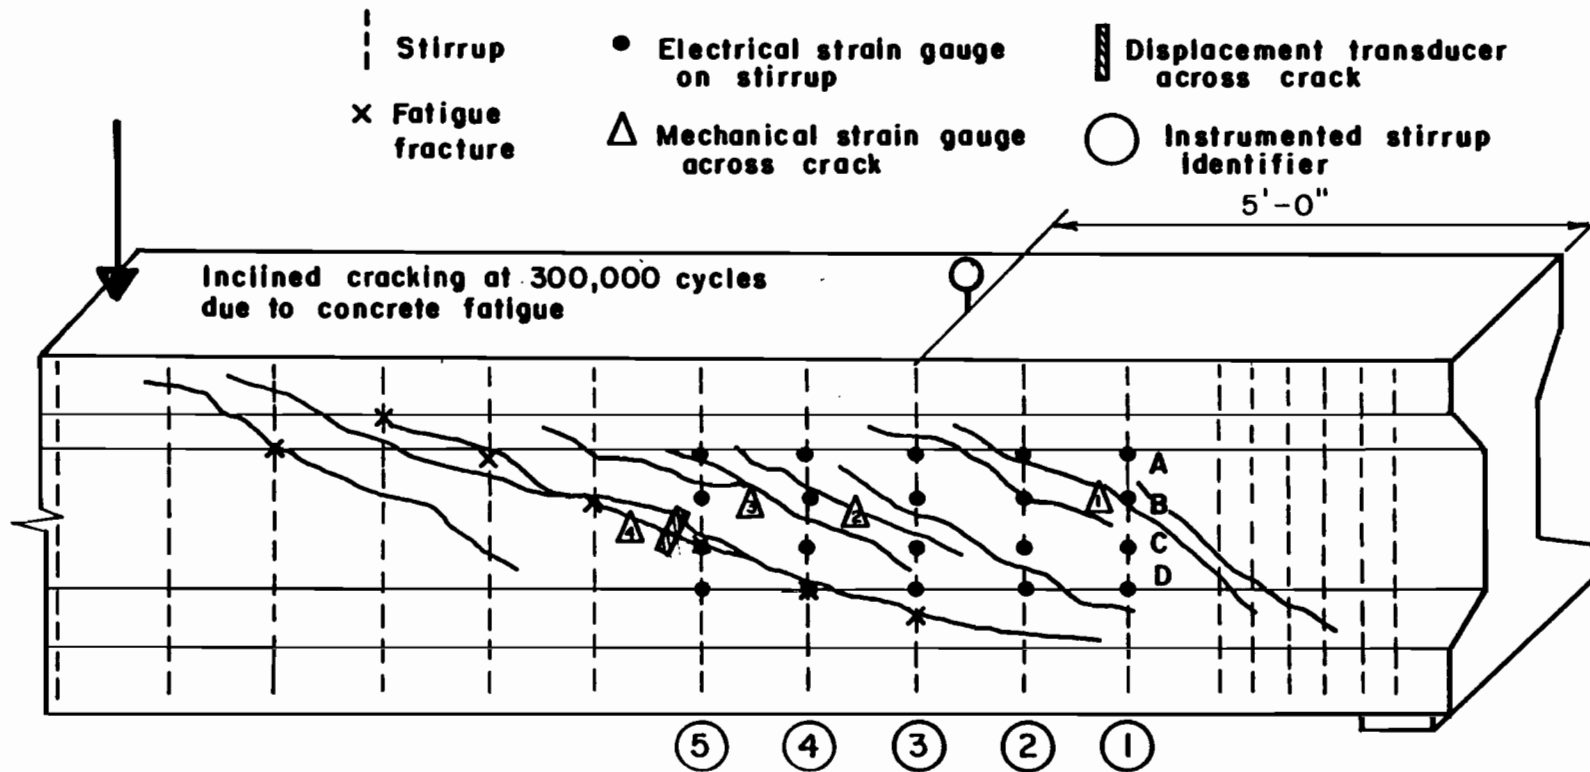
Beam 1, south shear span; instrumentation, crack pattern, and fatigue fractures
